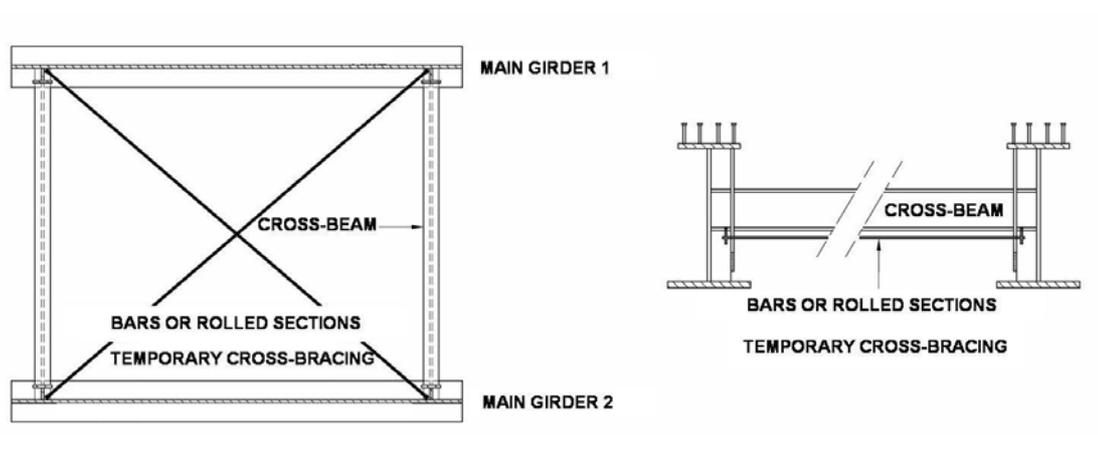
Outline diagram of temporary bracing (twin girder cross-beam composite bridge)
